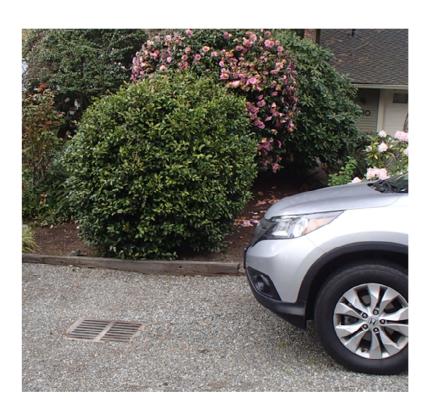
Looking east at CB 30a-24 at House #6110.
